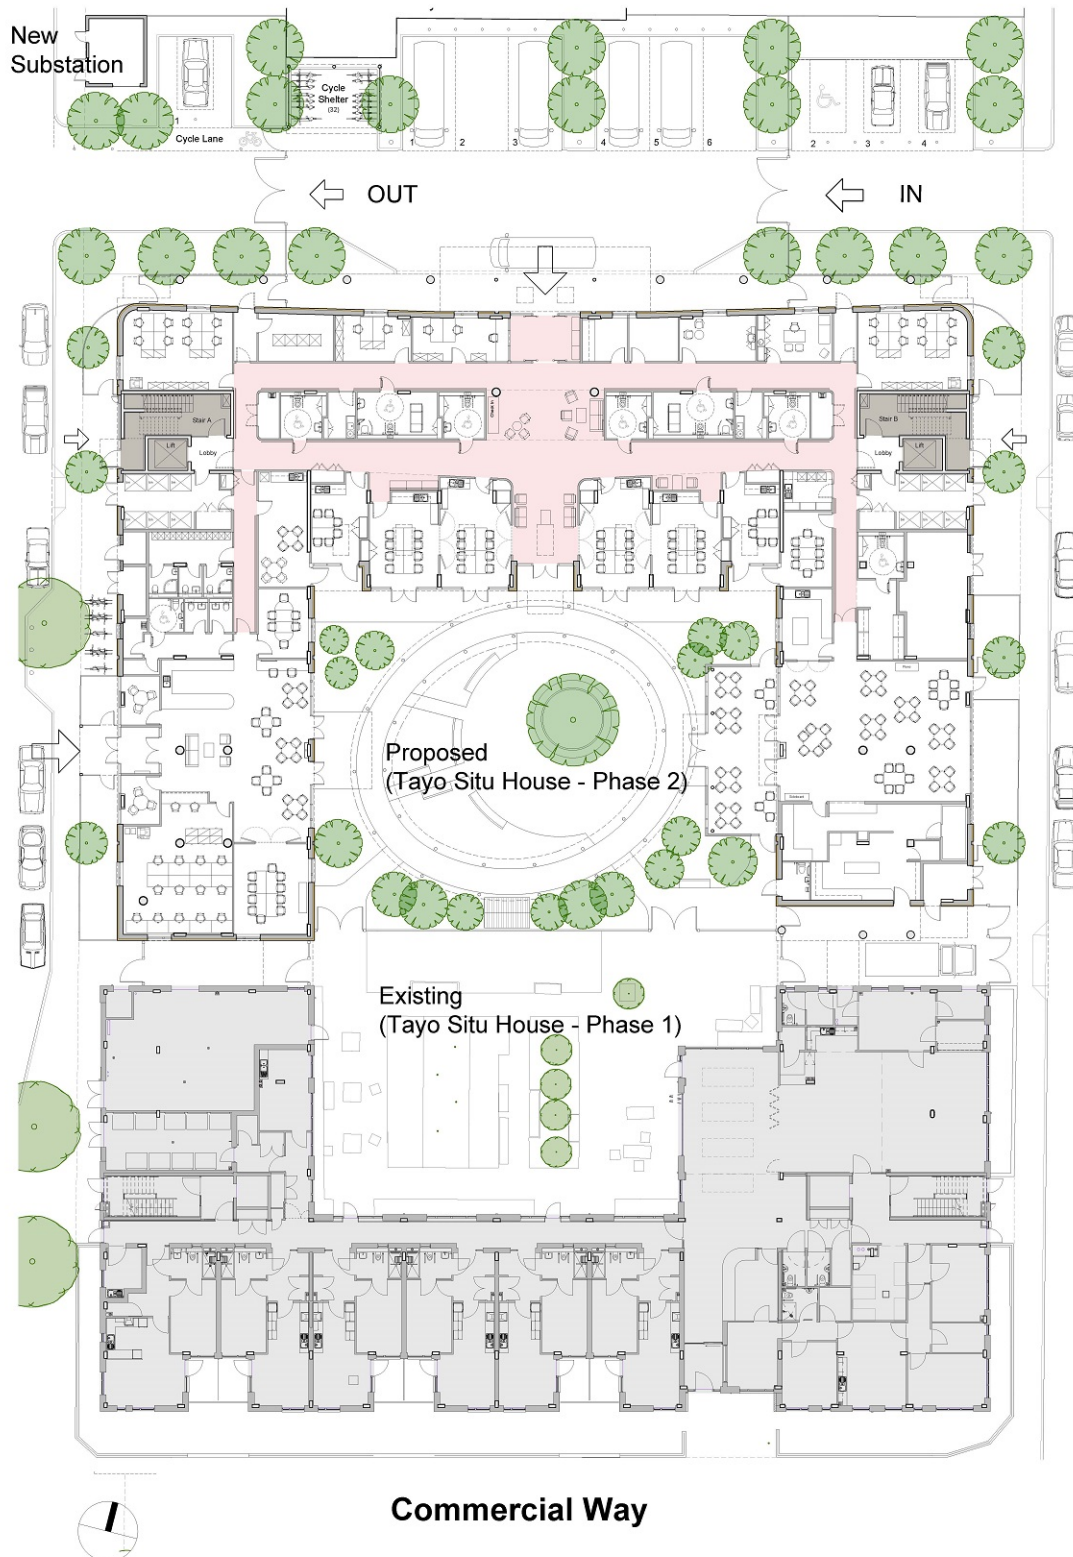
Ground floor plan – showing existing Tayo Situ Phase 1 (TS1) in grey at the bottom, proposed Tayo Situ House Phase 2 (TS2) with drop off and parking area to the north
